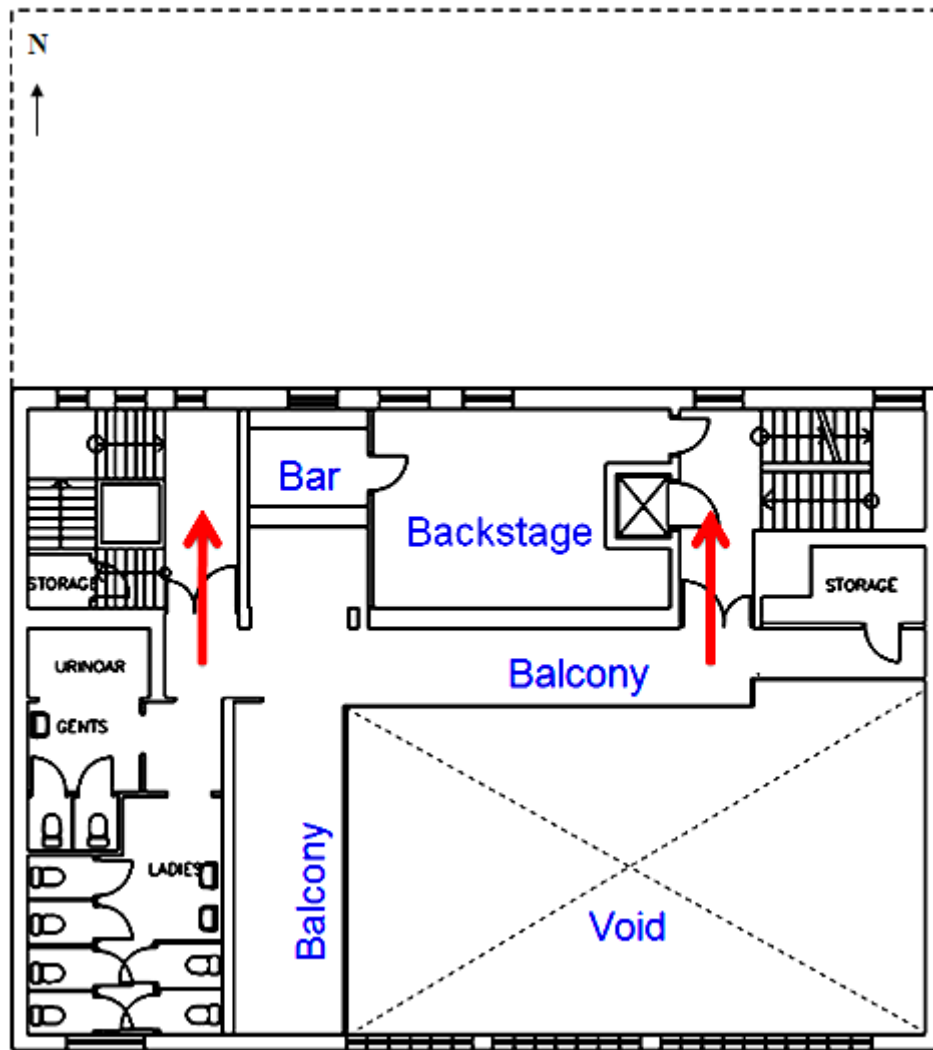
Floor plan of the proposed nightclub – Floor 3
